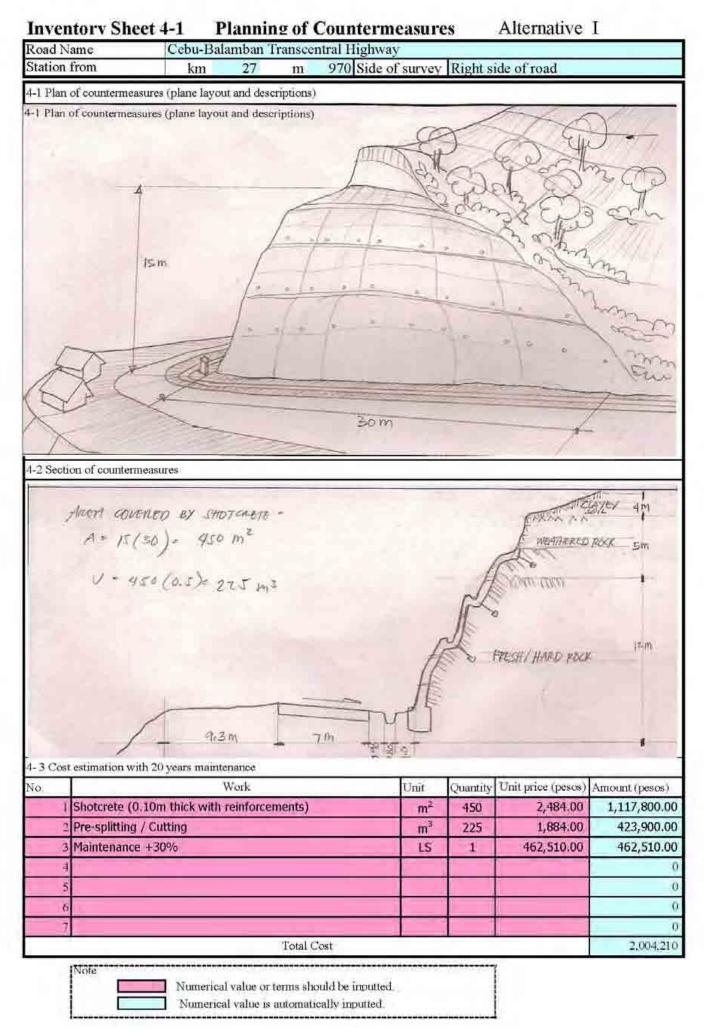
Example of Inventory Sheet 4-1: Planning of Countermeasure Alternative I for Rock Slope Collapse
